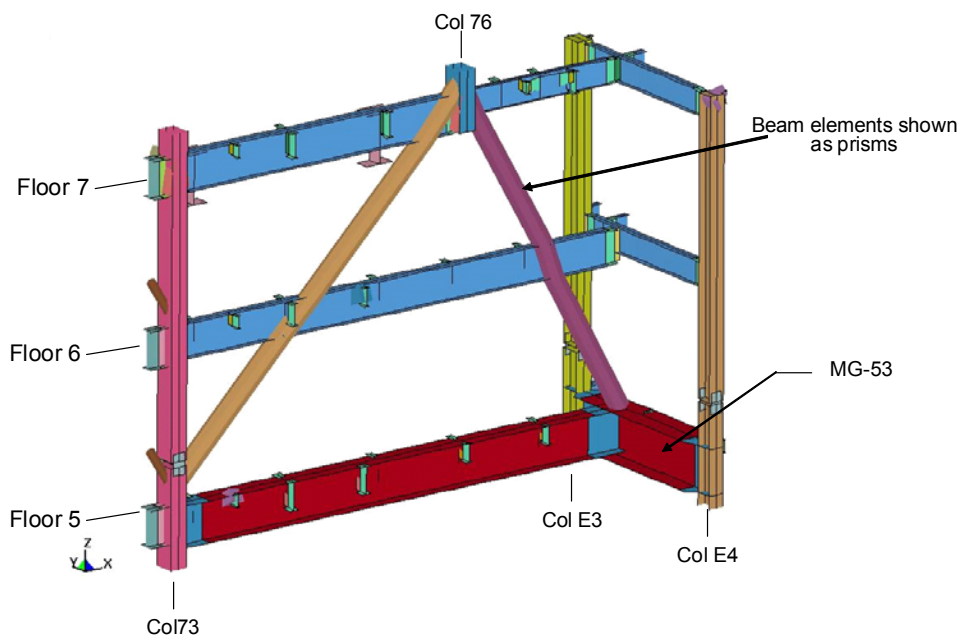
Detail of Truss 1 in the WTC 7 global model.
